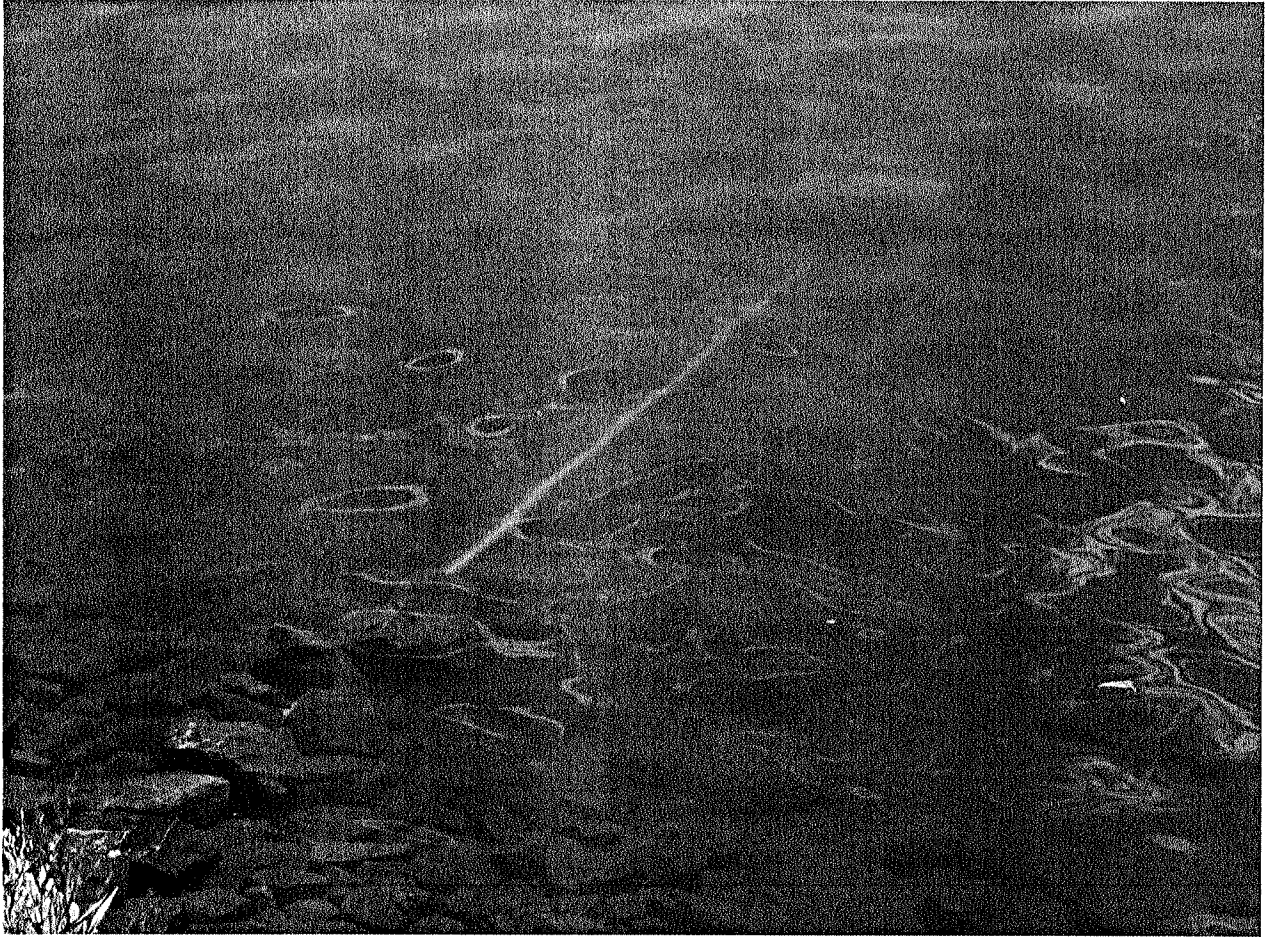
Typical water level transducer installation on sloping bank. Not the ridged conduit secured in place using natural stones.
